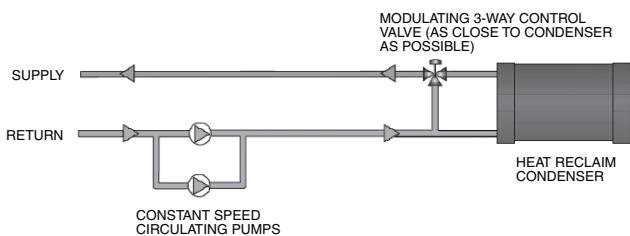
B — Three-Way Head Pressure Control Valve Location (Alternate)
